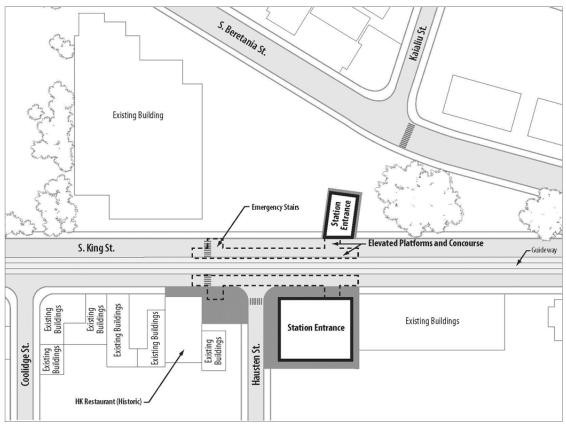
Beretania Street Tunnel Alternative Hausten Street Station
